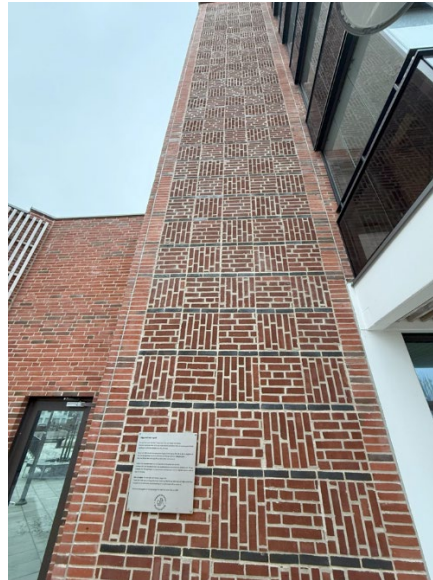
Site visit with stakeholders to a masonry façade constructed using reclaimed bricks in Helsingborg
